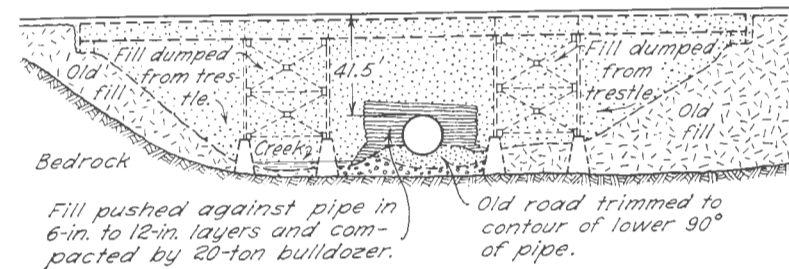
LONGITUDINAL SECTION THROUGH A FILL IN WHICH IS BURIED A PIPE CULVERT 15 FT IN DIAMETER
